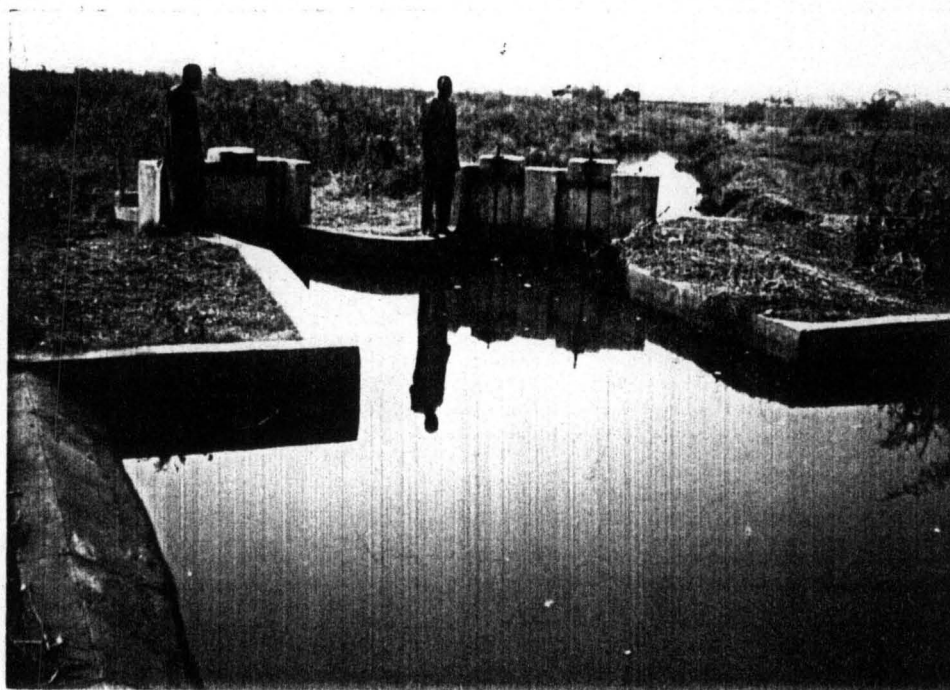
Bifurcation structure on main canal with Left and Right Bank Secondary Canals.
